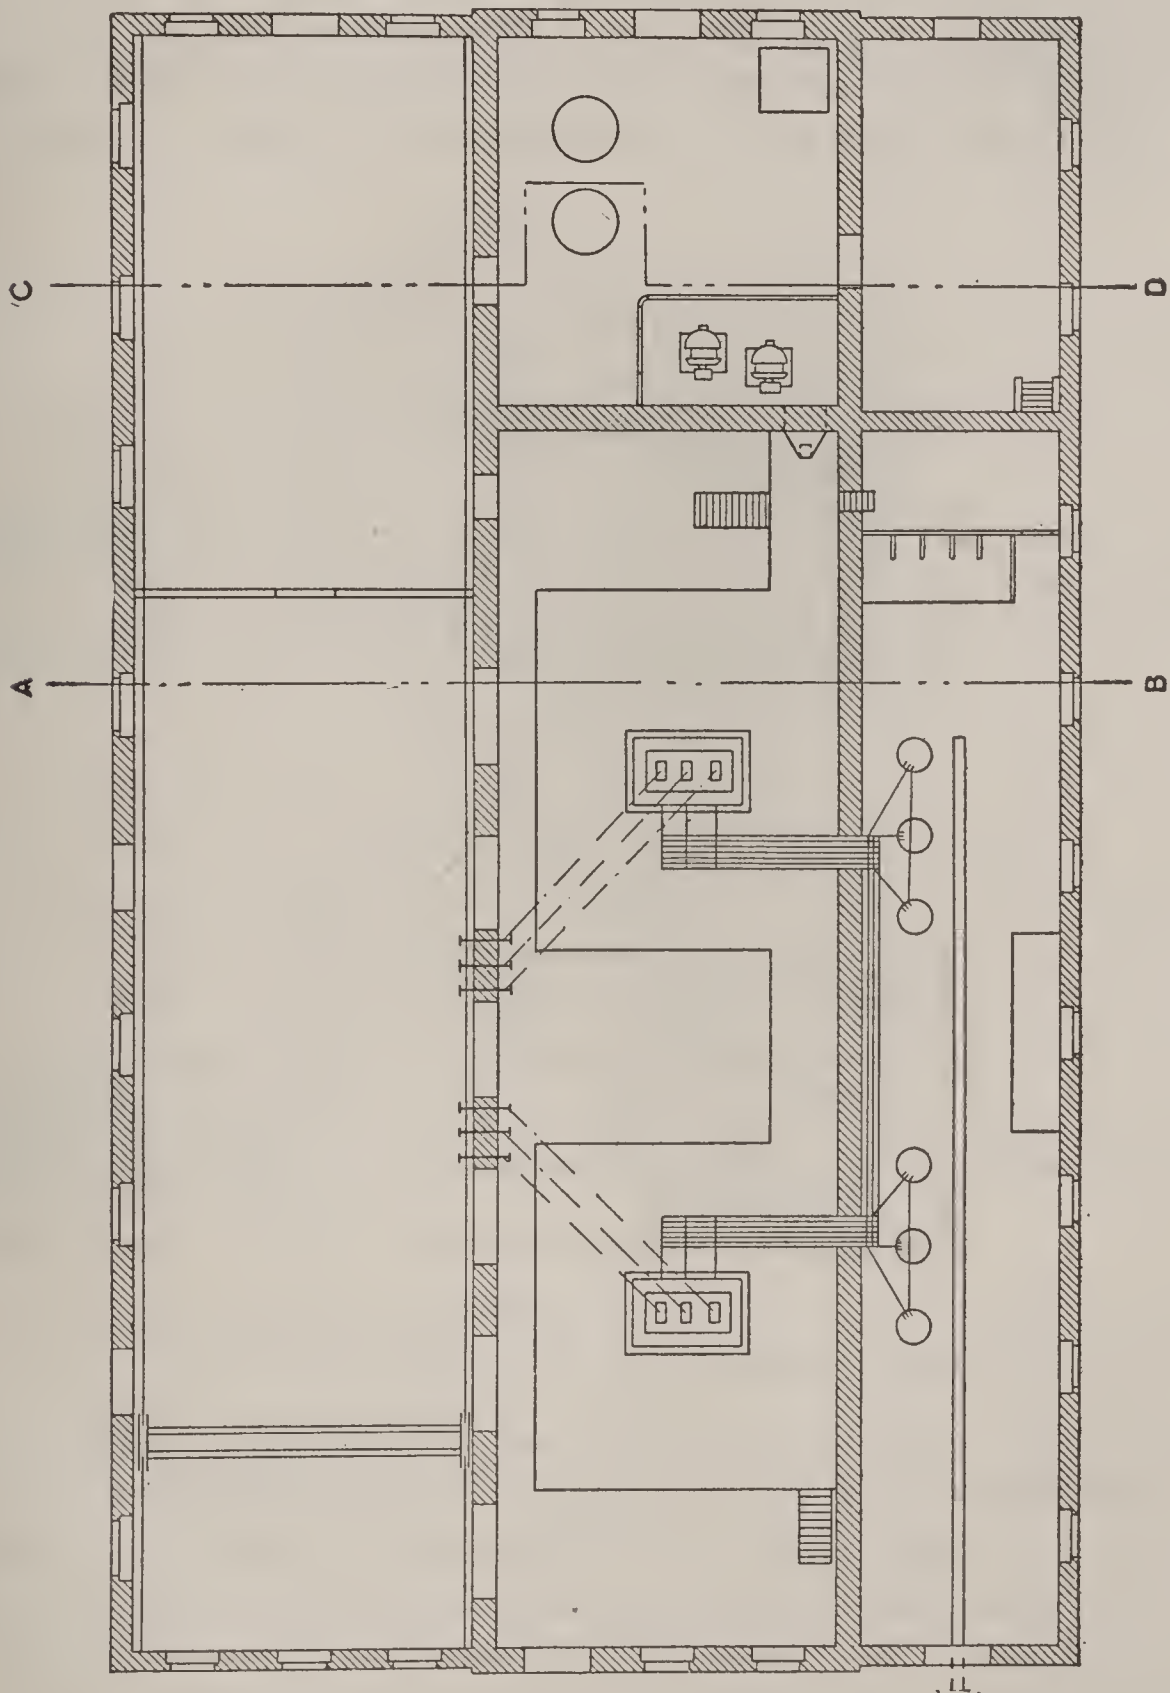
Plan of ferrosilicon plant designed by Conrad and Pick.
